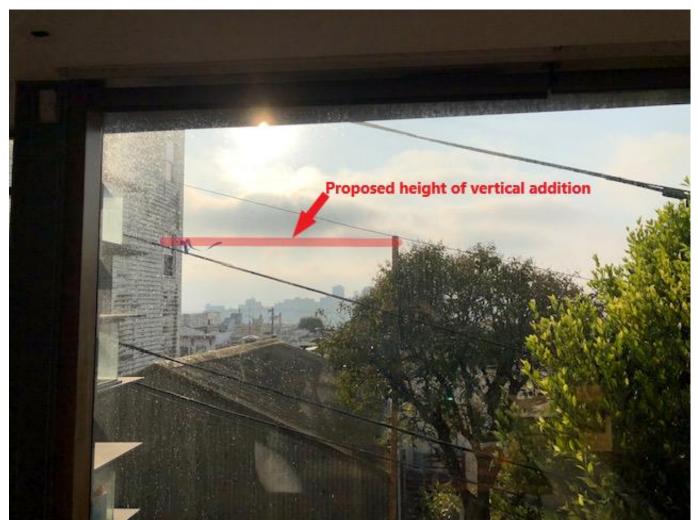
Proposed vertical addition to 17 Reed Street – Photograph from Mr. Stone's Living Room
